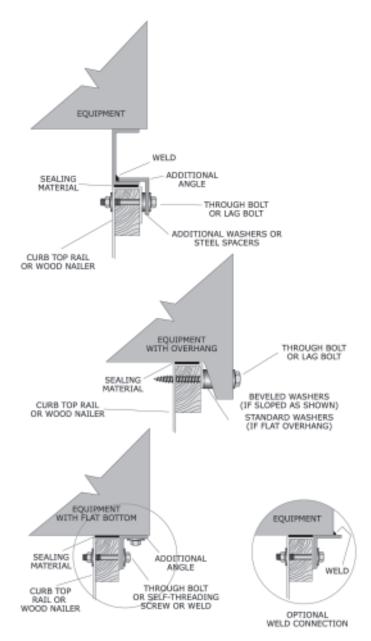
Attachment of equipment to a built-up curb or pre-manufactured curb.
